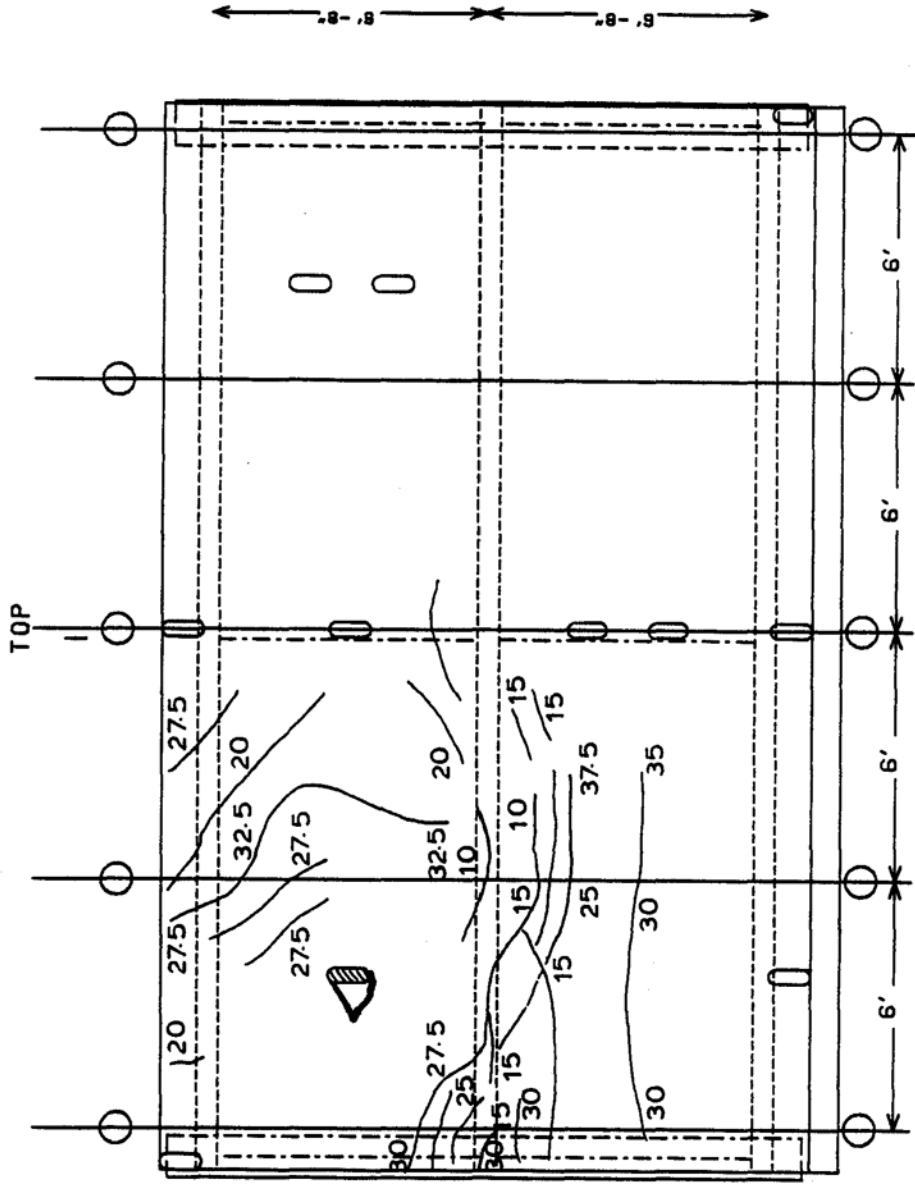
Top Cracking Pattern (First Bridge - Test No. 8)
